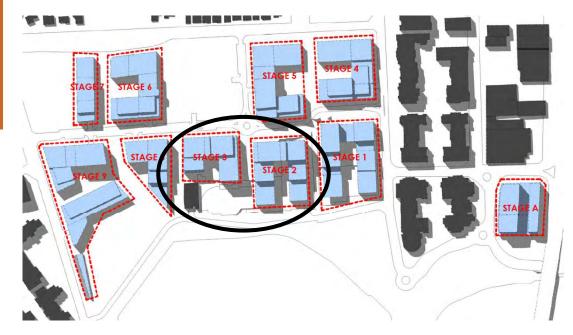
Extract from Indicative Staging Plan prepared by R+M Architects detailing the location of the Stage 2 and Stage 3 buildings
